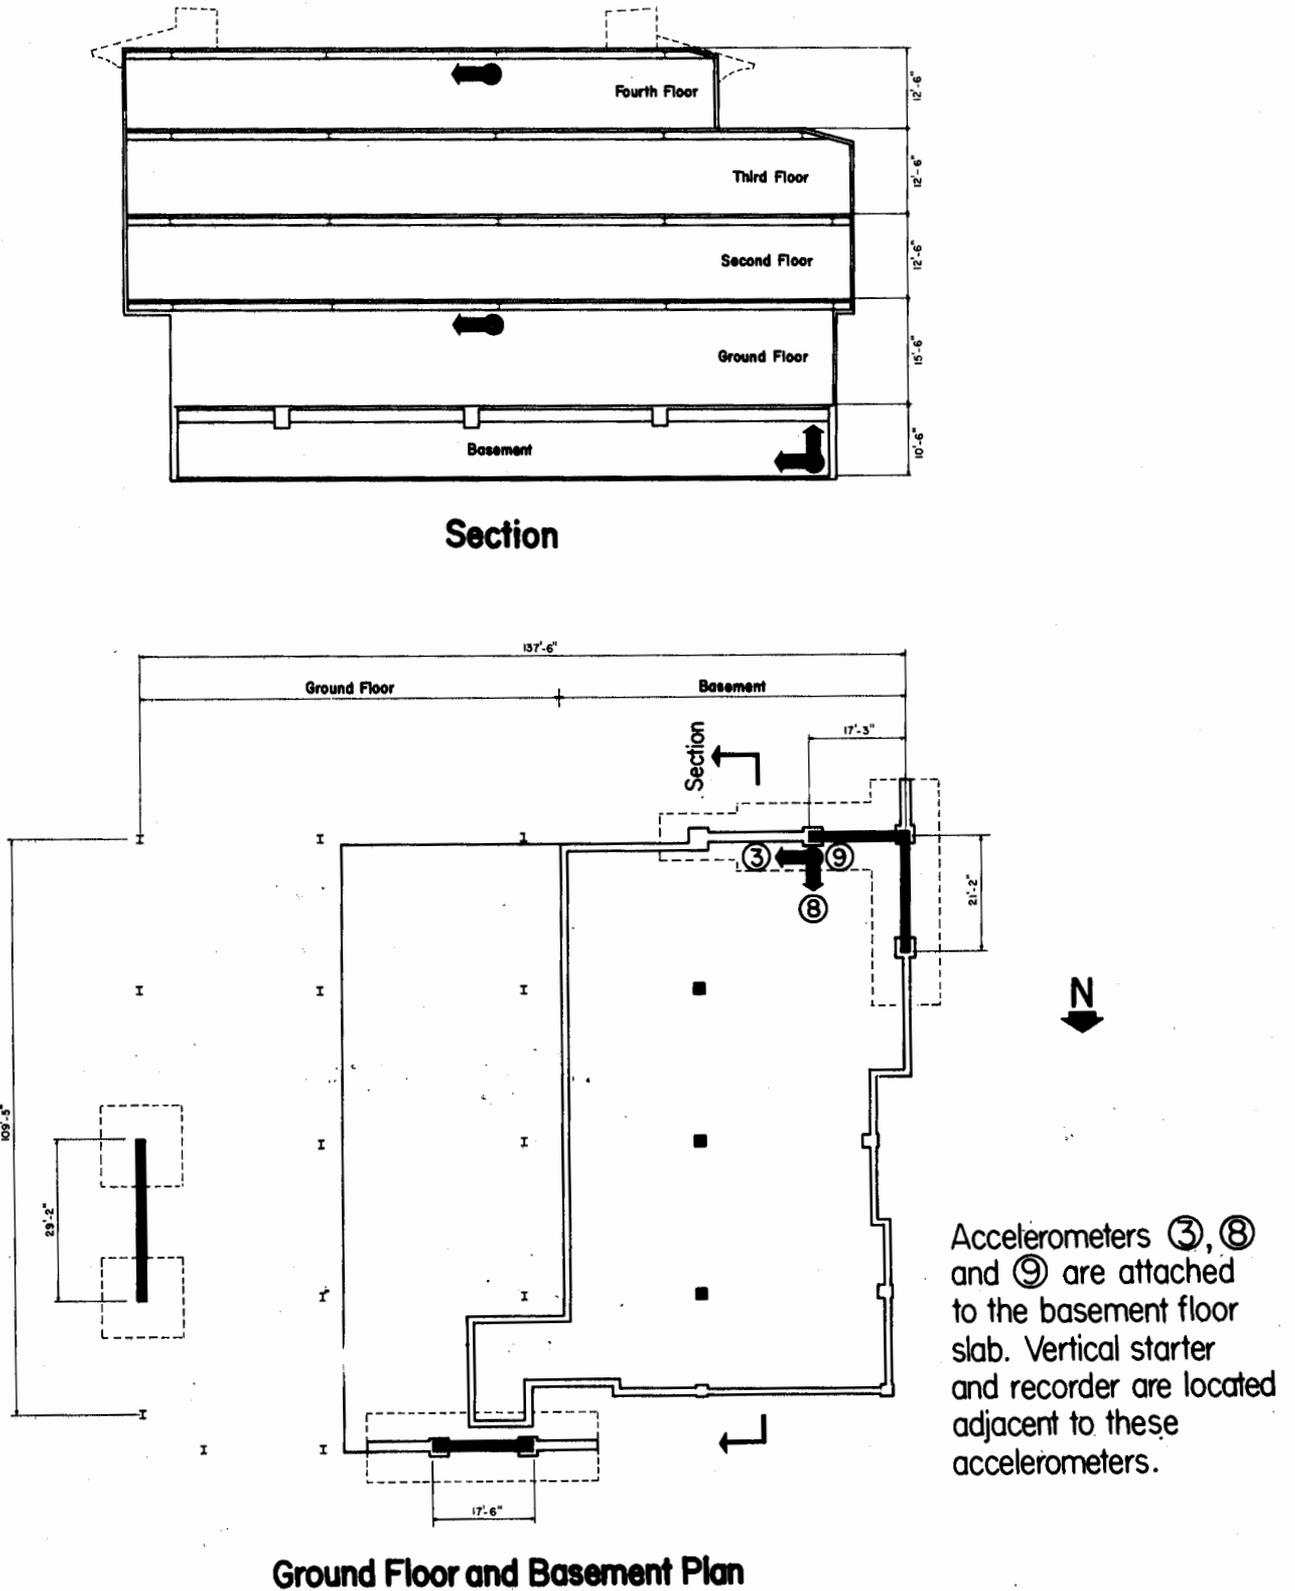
Section and Plan of Freitas Building, Santa Barbara, California
